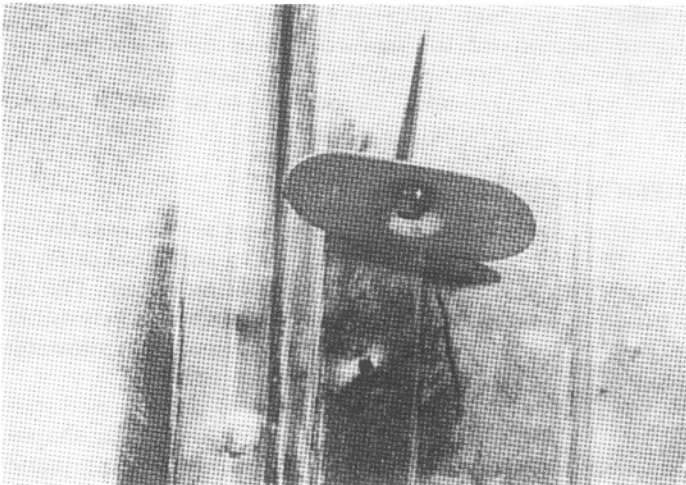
Field observation of a roof failure showing fastener pull-out.
